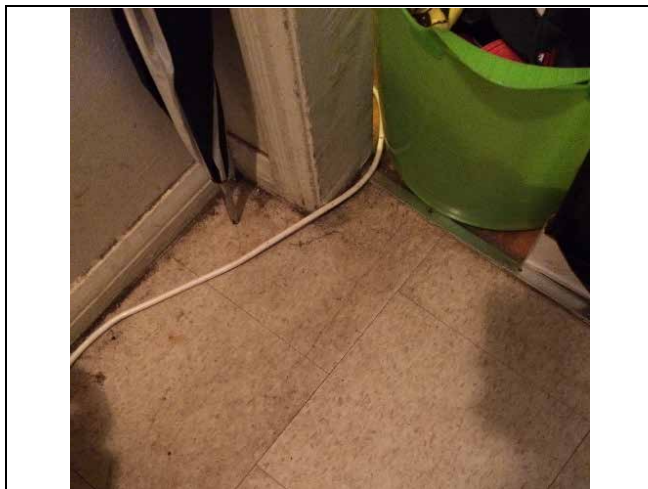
Asbestos-containing drywall joint-fill compound and presumed asbestos-containing mastic associated with 12"x12" vinyl floor tiles – beige and yellow smears in the foyer at 83 Brighton.
